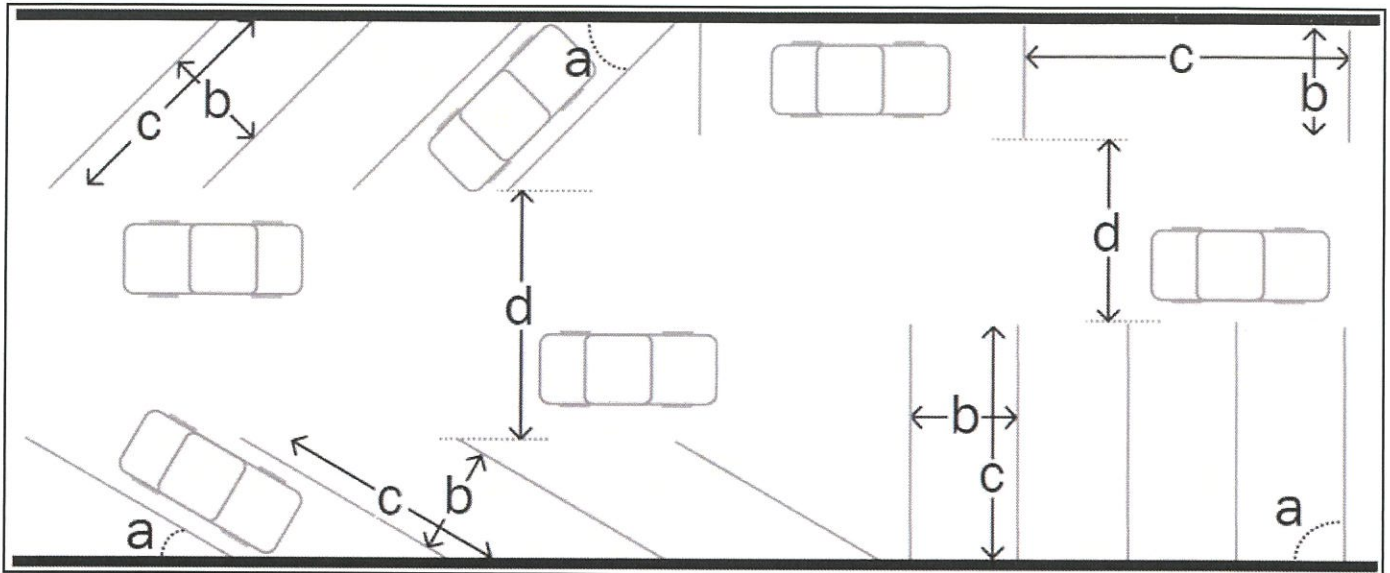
OFF-STREET PARKING REQUIREMENTS
